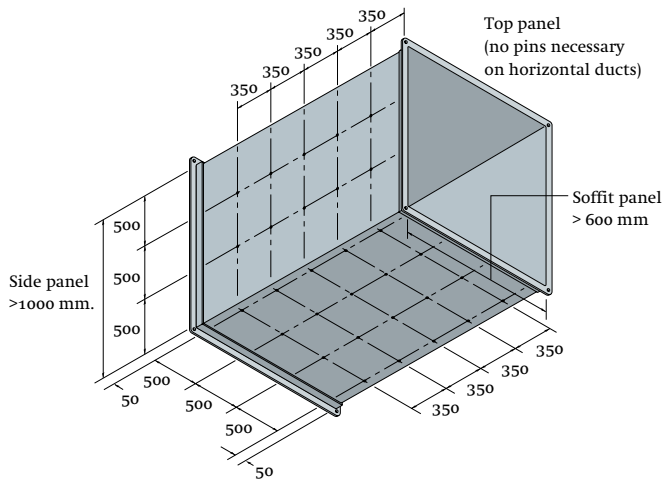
Steel pin arrangement where side panel is greater than 1000 mm or soffit panel is greater than 600 mm
